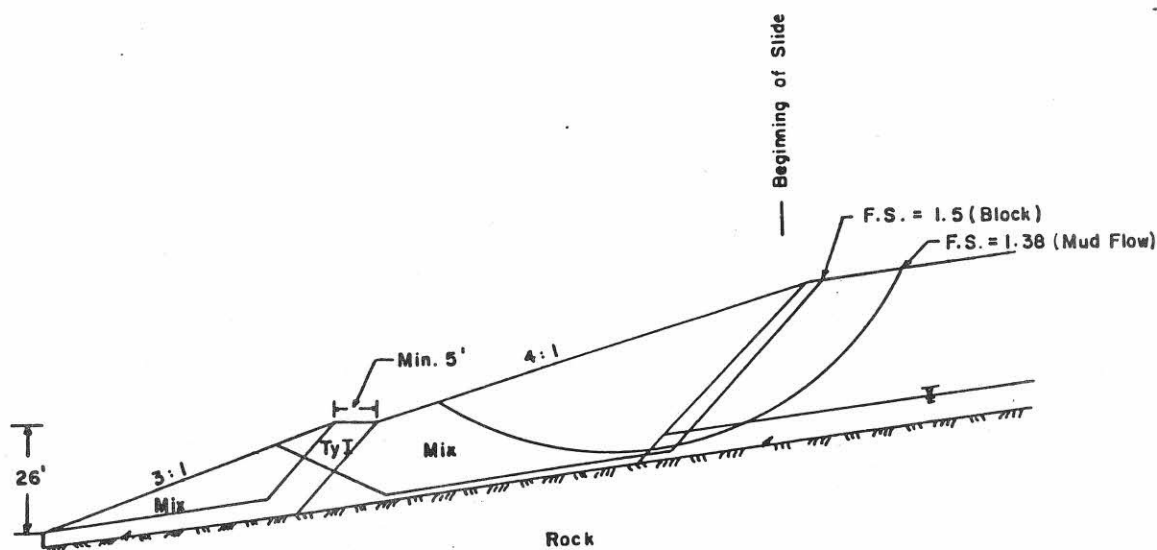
This typical section from the construction plans illustrates the design criteria taken to correct the Slope Failure at STOP 3.
